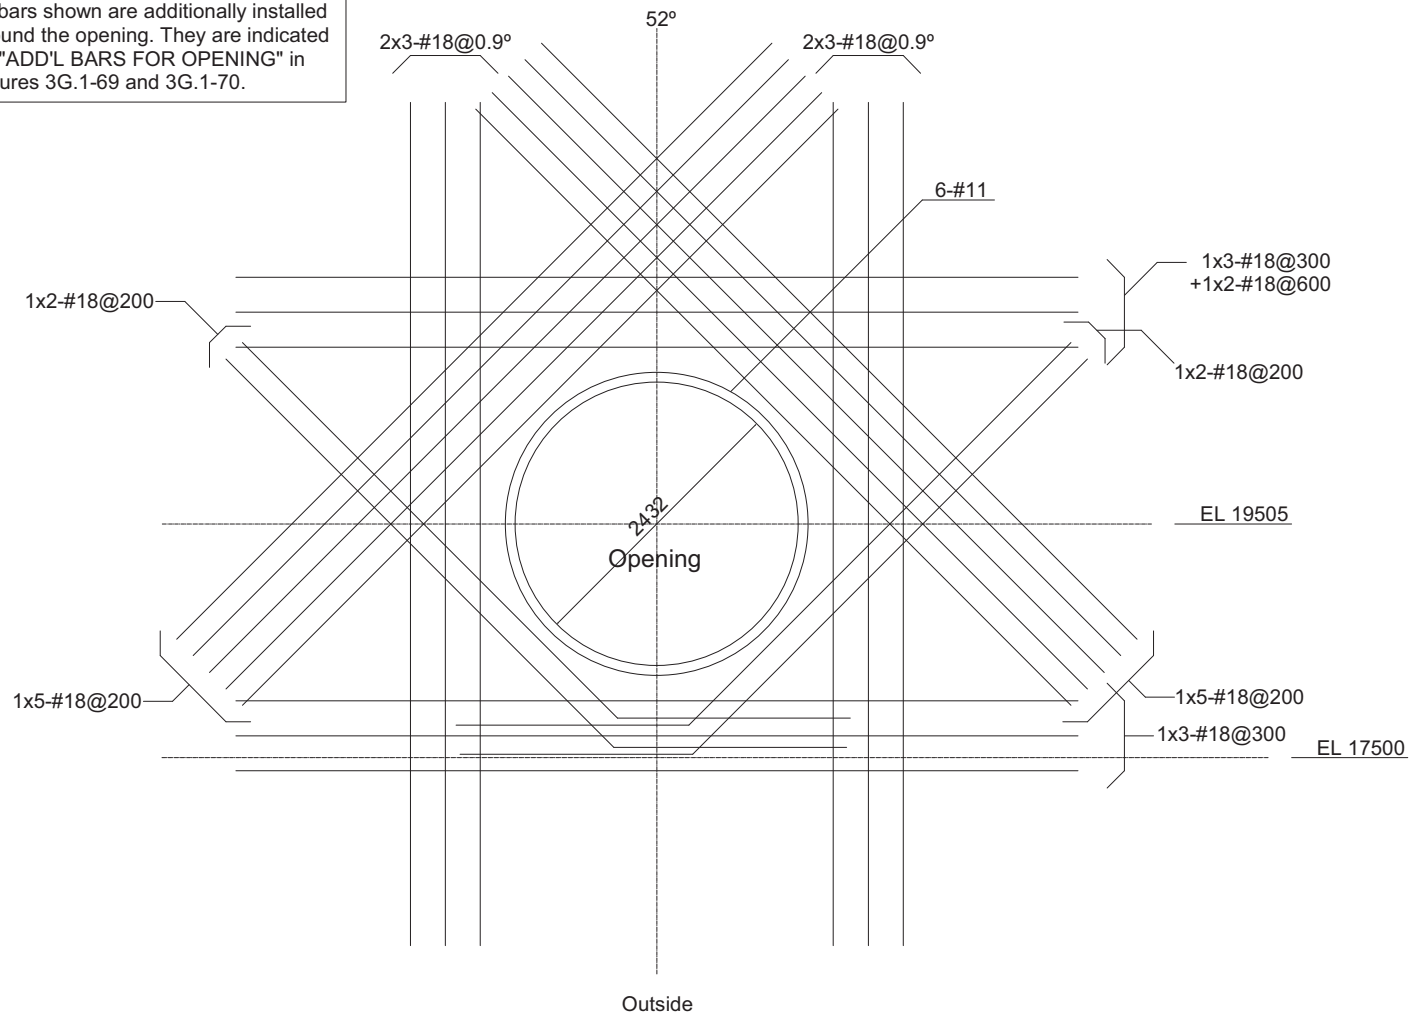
G.1-67. Additional Reinforcements in RCCV Wall Around Upper Drywell Personnel Airlock Opening (Inside Face)
